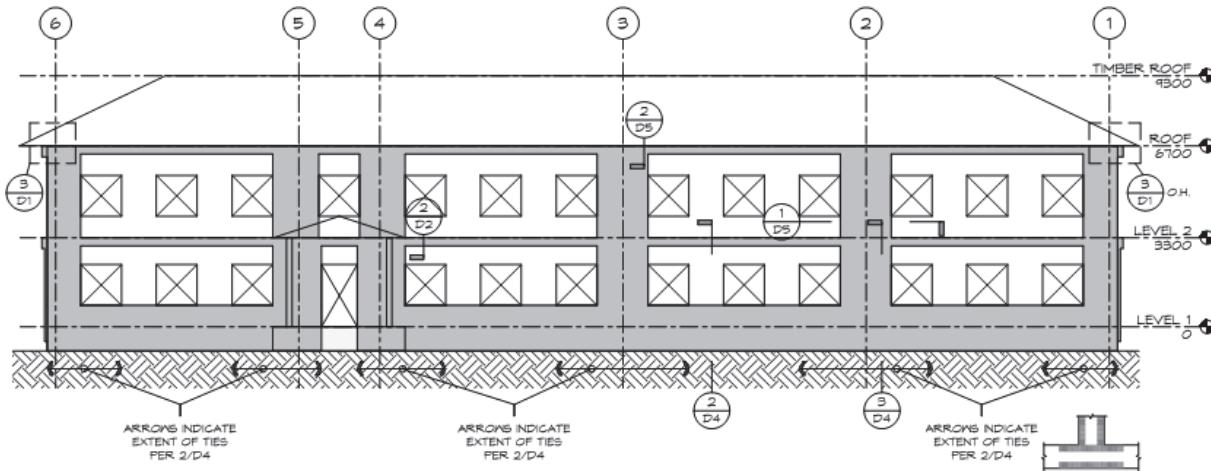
Reinforced concrete finger piers added in CM Increment 2.
